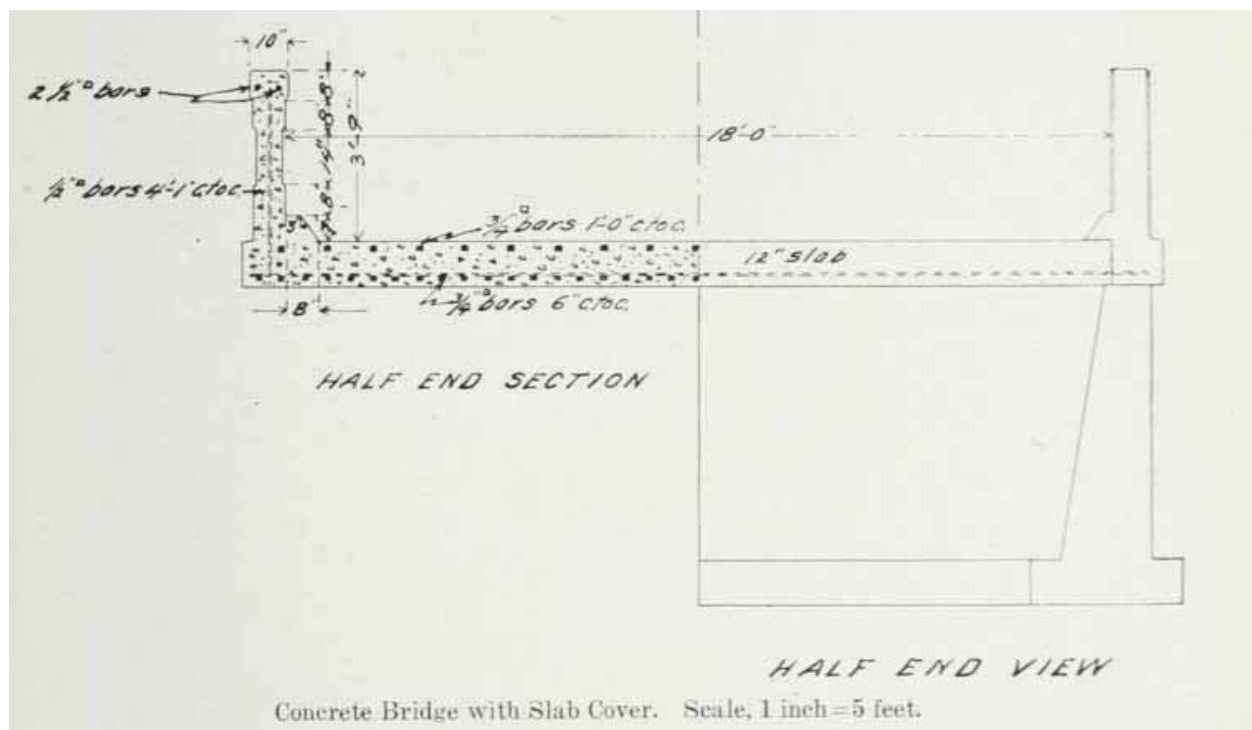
Half end view of a typical concrete bridge design with slab cover [Annual Report on Highway Improvement Ontario for 1910, No. 14, 171].
